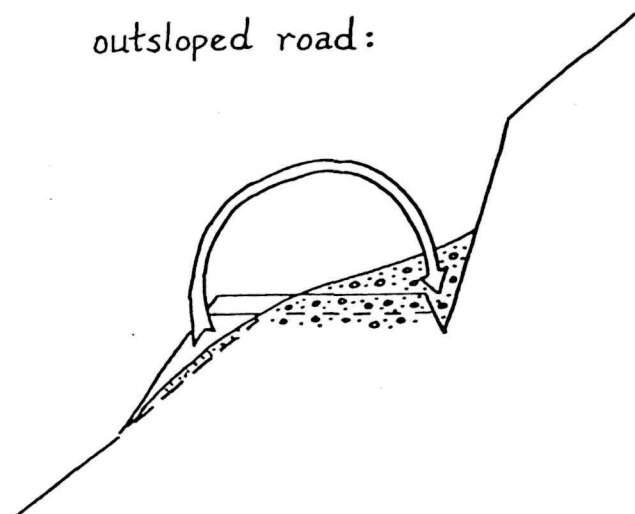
Slope configuration across logging road after heavy equipment transfers fill and grades an outslope.
